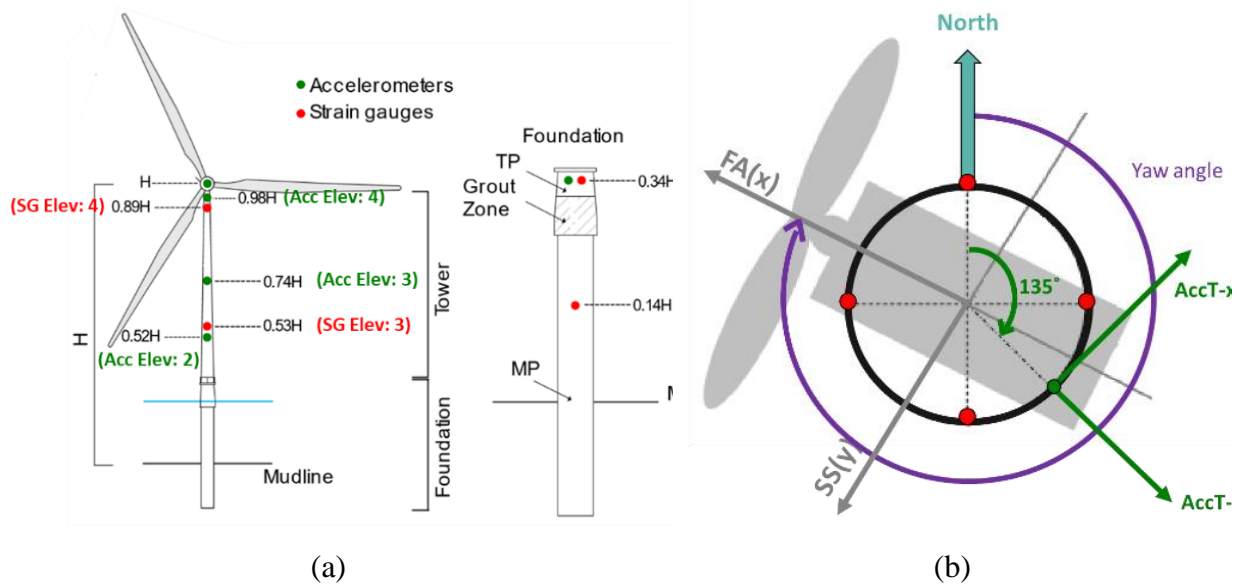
Instrumentation layout a) Elevation View b) Top View
